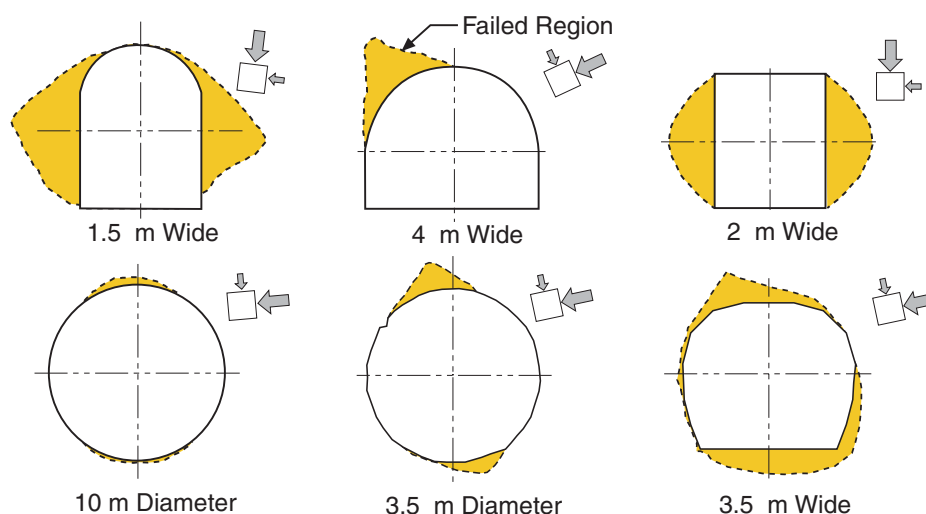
Extent and shape of stress-induced spalling failure observed around various shaped underground openings, after Martin et al. /1999/.
